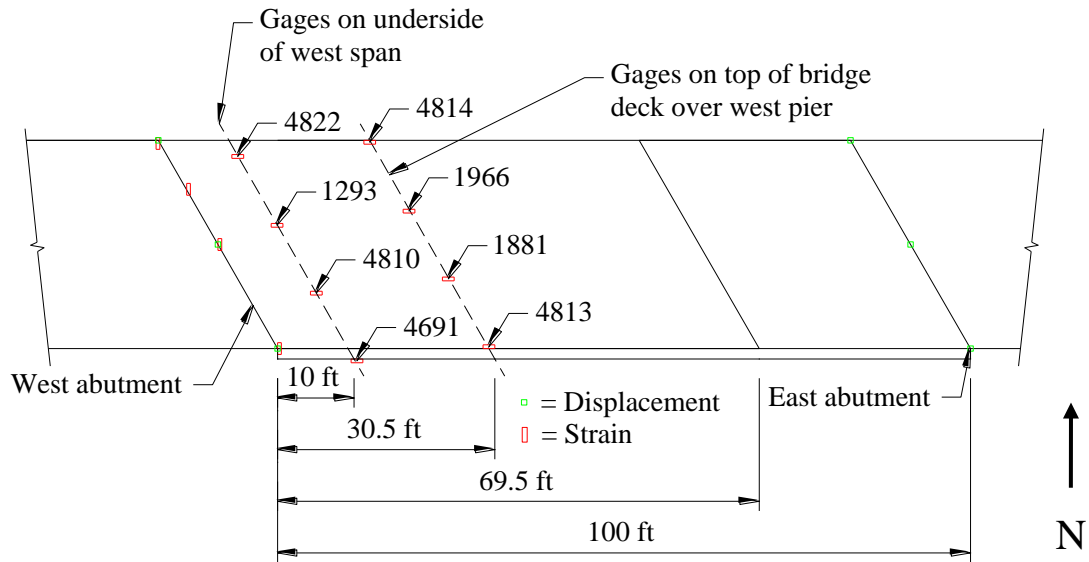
Plan view of instrumentation locations for temporary system used during live load testing (see Figure 5-98 for instrumentation on the abutments)
